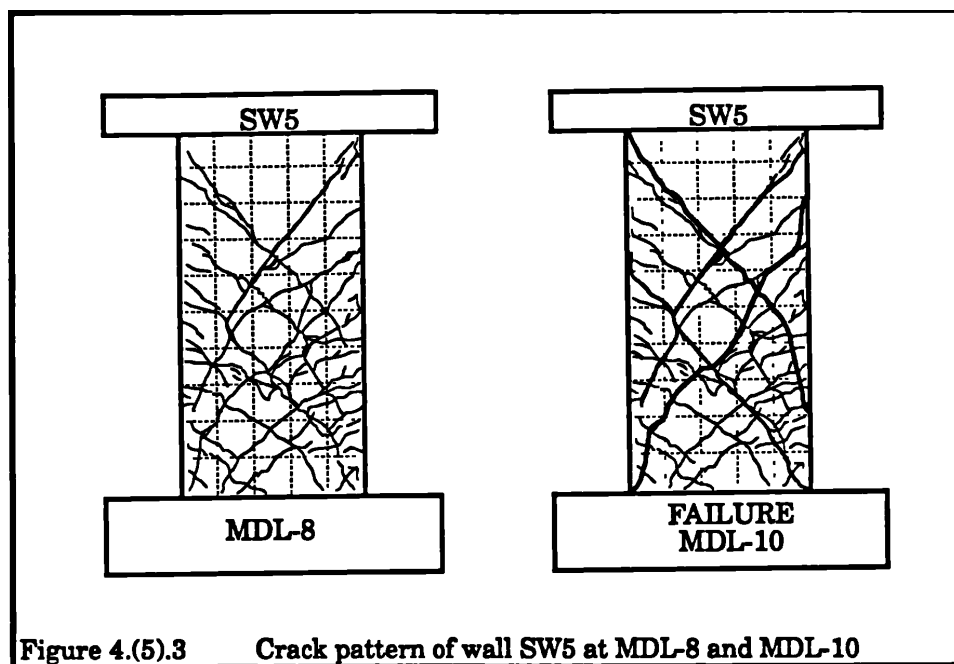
PilaSW5: DS4i - cracks at MDL-8 (shear cracks extend length of wall) and MDL-10 (shear reinf. yield)
